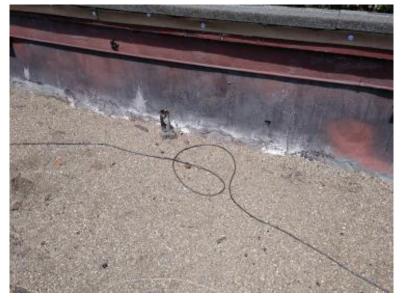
Caption: Main Roofing Field with ACM Roof Mastics
